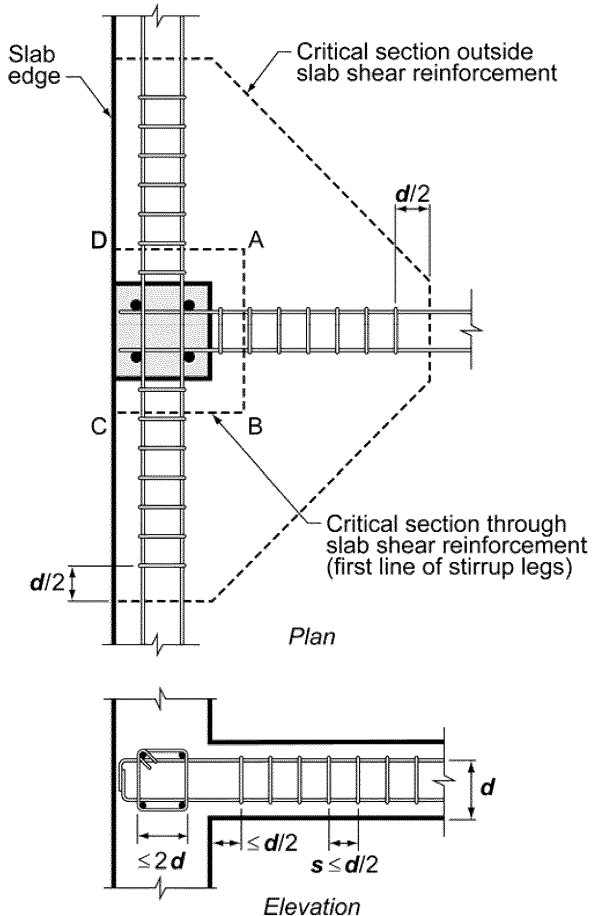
Arrangement of stirrup shear reinforcement, edge column.
